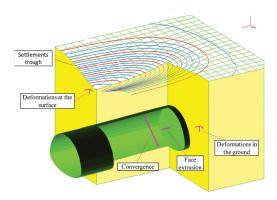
Ground deformations and surface settlements during the excavation of a shallow tunnel.
